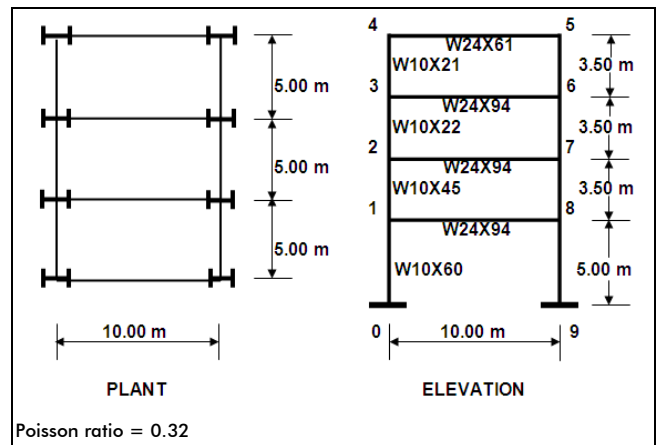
Floor-plan and elevation regarding an office building constructed with steel frame structure.
